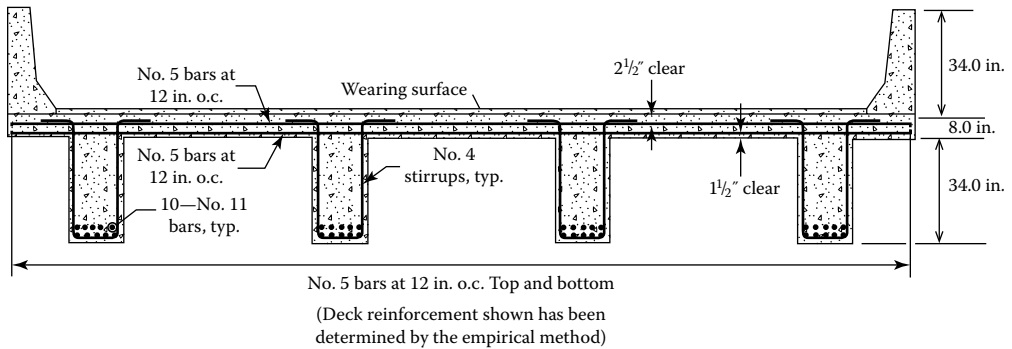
T-beam bridge cross section showing final layout of reinforcement. (Adapted from Achneider, E.F. and Bhide, S., *LRFD of Cast-in-Place Concrete Bridges*, Portland Cement Association, Chicago, IL, 2004.)
